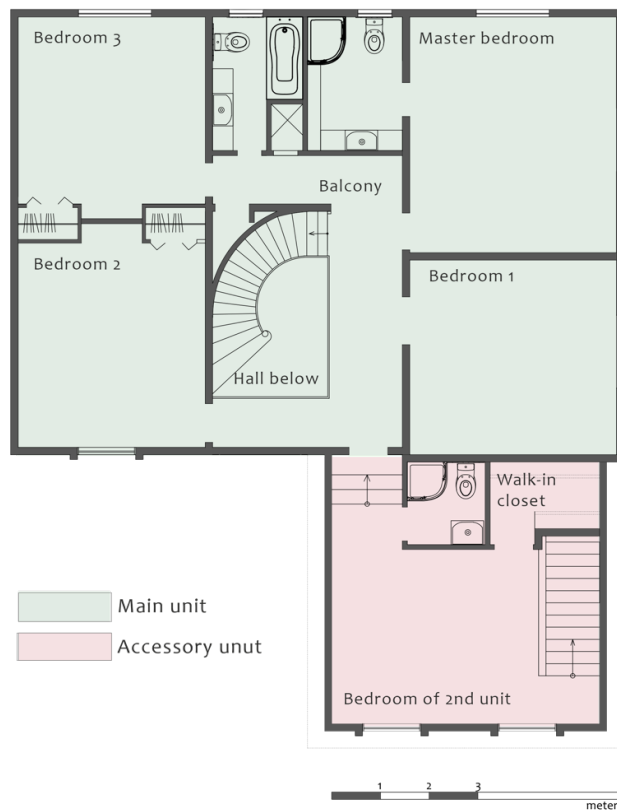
Second floor plan. Alterations made: The big studio room was redesigned to become an independent bedroom with a walk-in closet and a bathroom. The room has a direct connection to the balcony of the main unit
